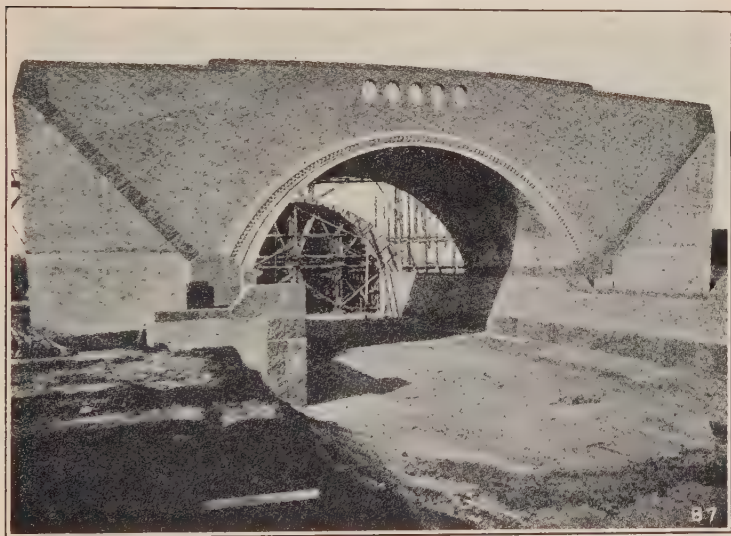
RAILROAD BRIDGE, MÜHLHEIM, GERMANY.
